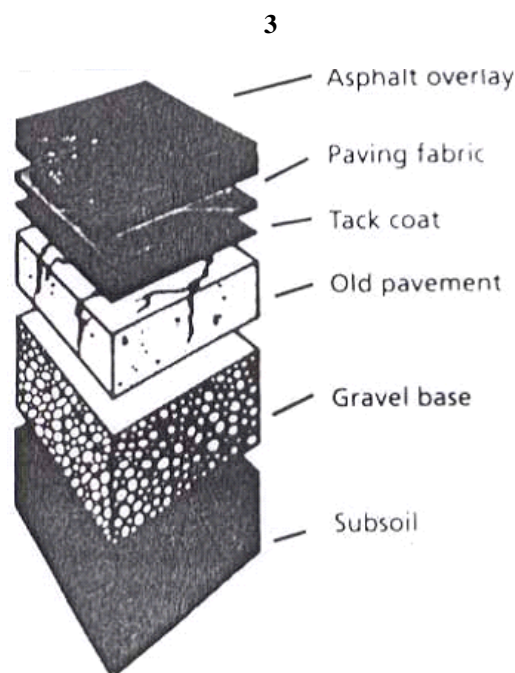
Typical cross-section of a paved road with a paving fabric interlayer
